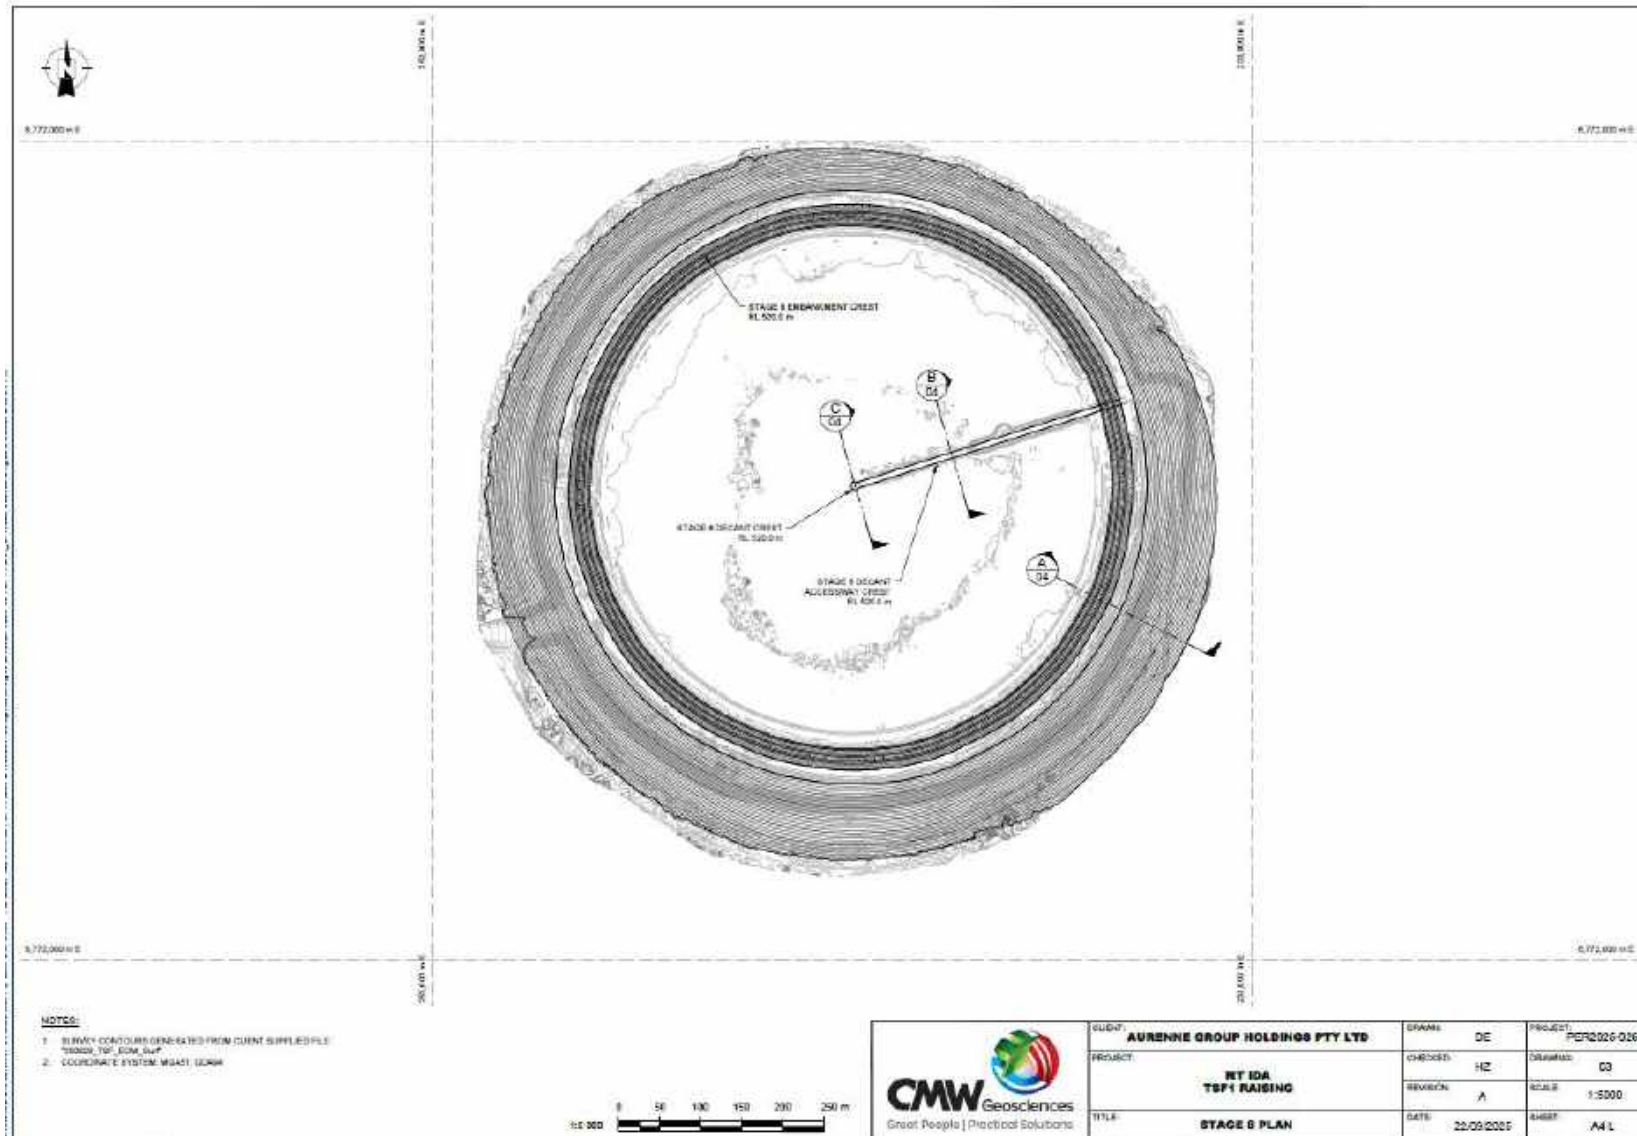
IWL TSF Stage 6-8 Raising - Stage 8 Plan
